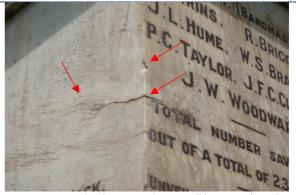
Detail – dirt particulate, small horizontal cracks in marble substrate; loss to marble edge.
